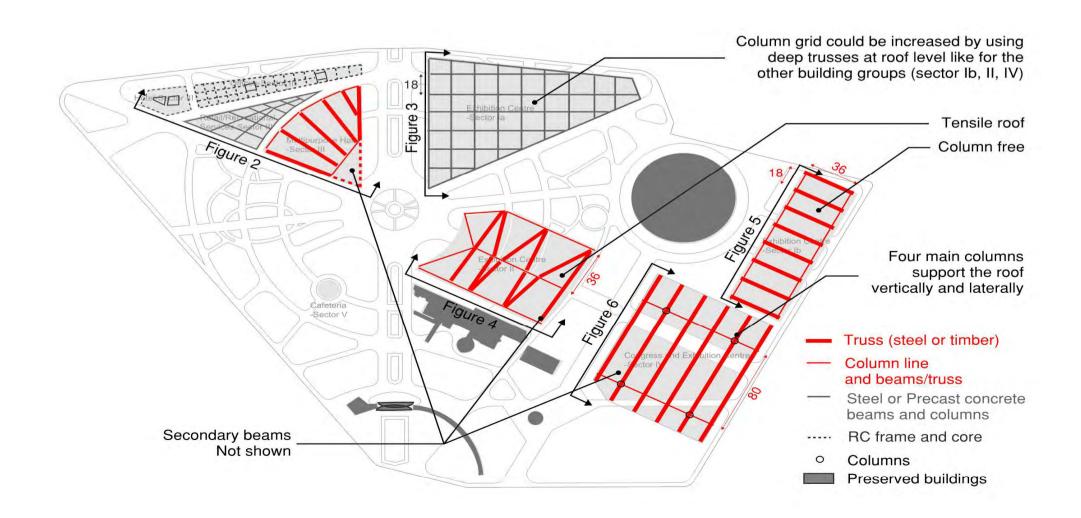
ConfEx Park Plan. Typical grid lines and potential arrangement for the different building sectors.
